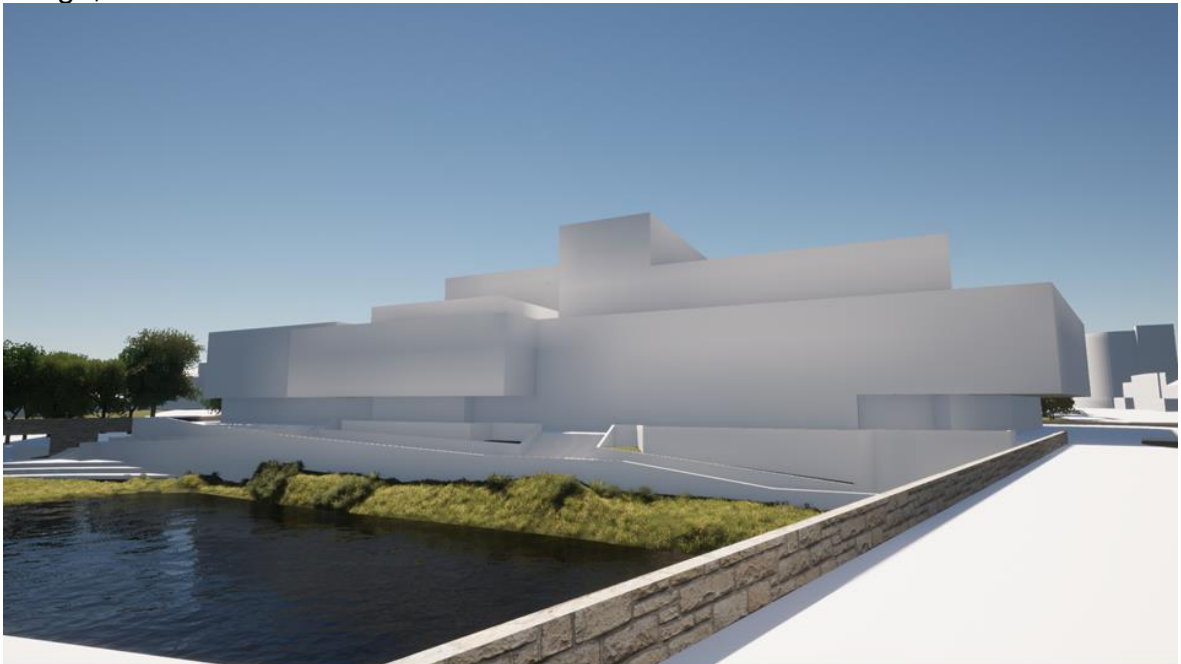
Concept design render looking north-west from Lennox bridge, Parramatta
